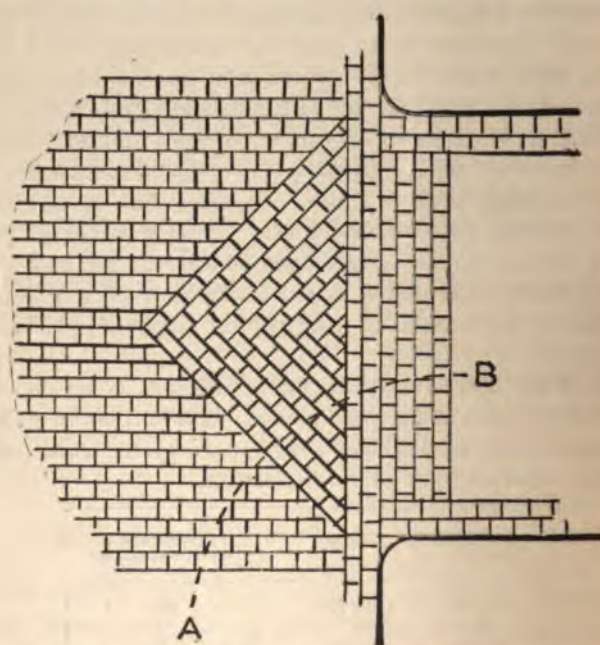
PLAN OF STREET PAVED WITH WOOD BLOCKS.
